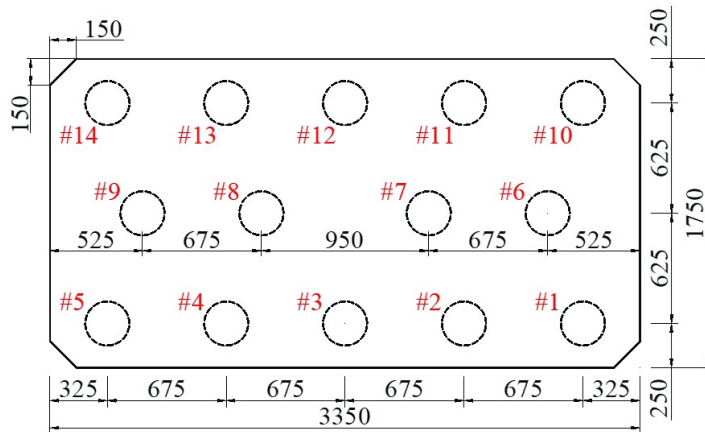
Detailed dimensional drawing of the pier cap (unit: cm).
